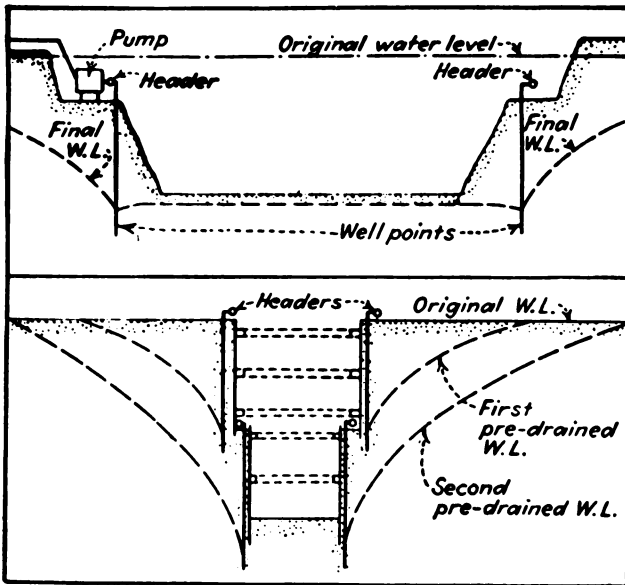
Diagrams illustrating the use of well points for open and for trench excavations in water-bearing ground.
